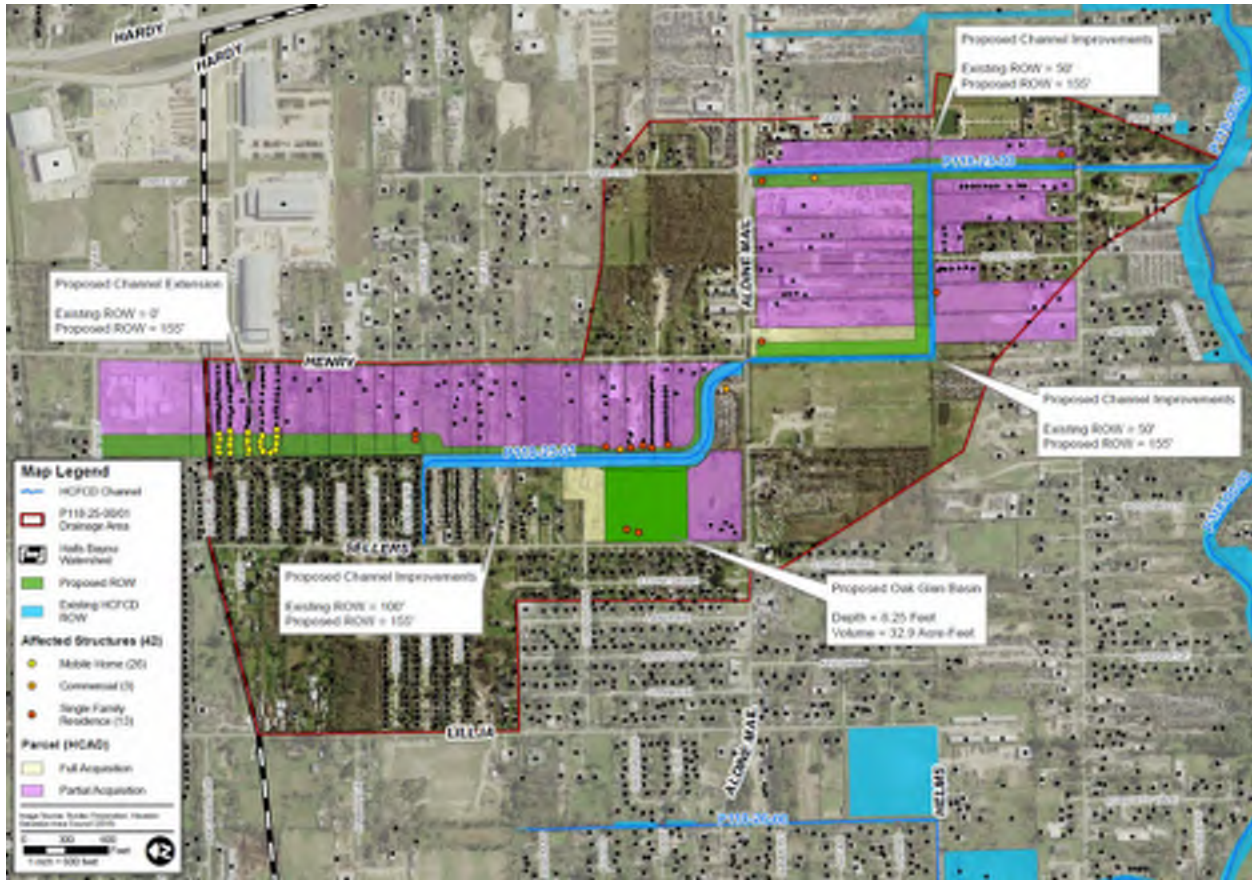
Proposed ROW – Alternative 3b (Recommended)
